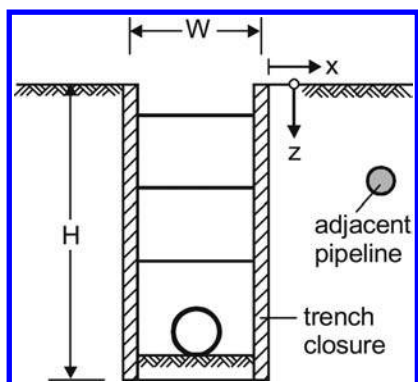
Sewer trench and adjacent pipeline: System and denominations.
